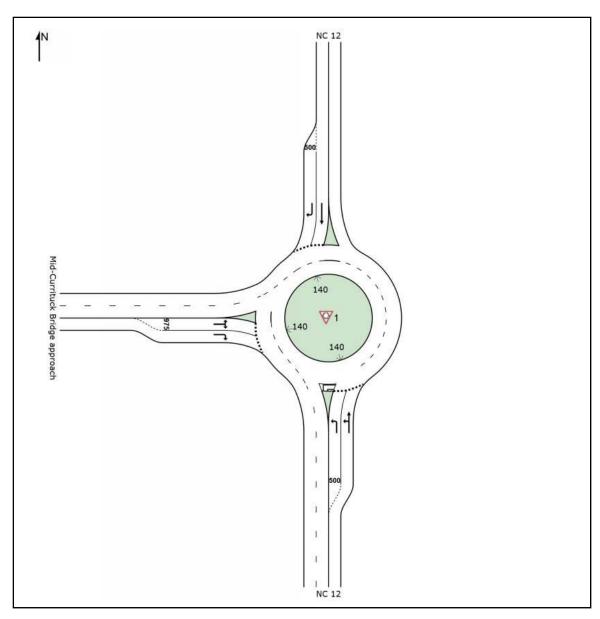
Proposed Roundabout at Mid-Currituck Bridge / NC 12 Intersection
